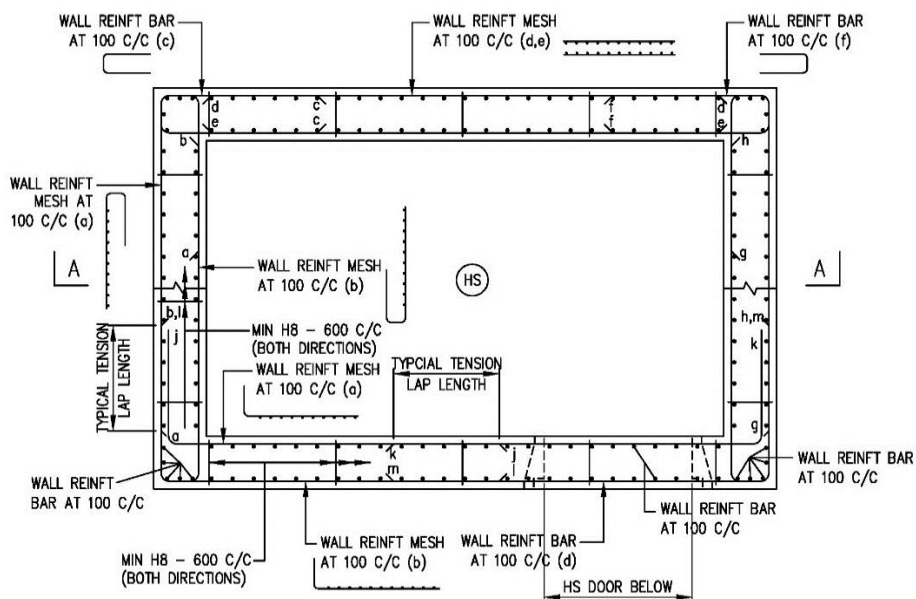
PLAN OF HS AND SS WALL ABOVE DOOR OPENING
